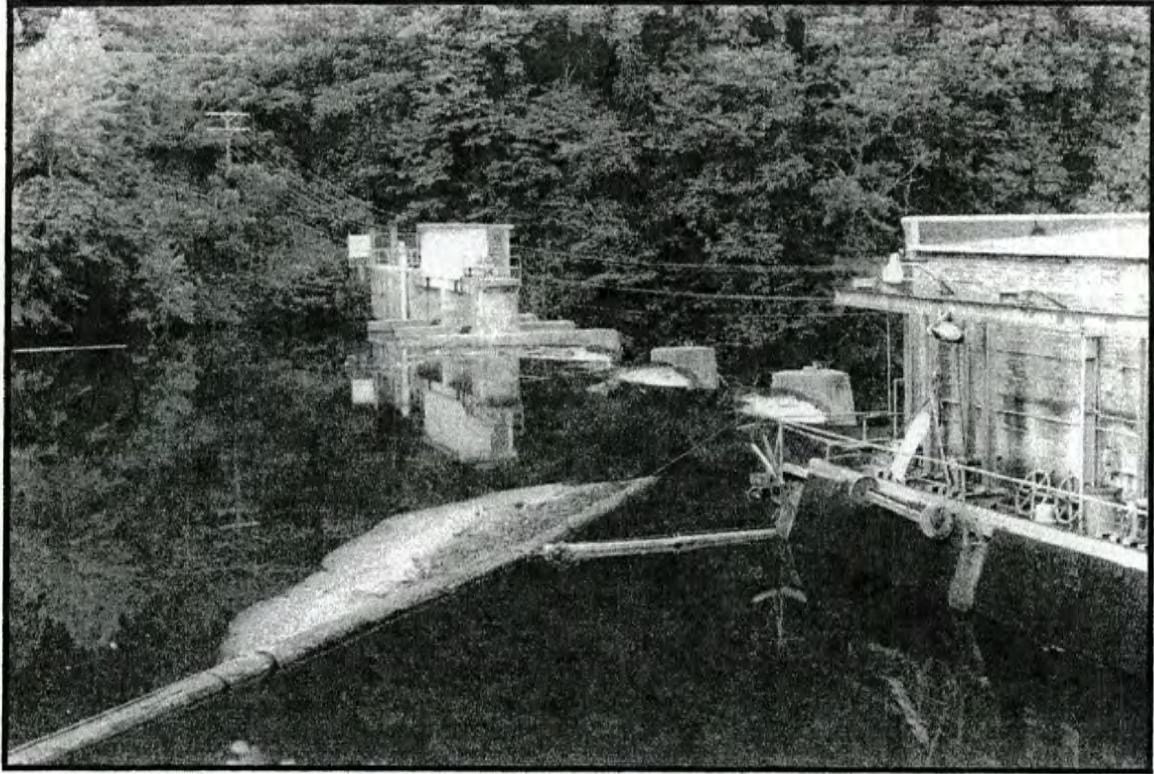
The Bryson Dam and gatehouse, view from above.
